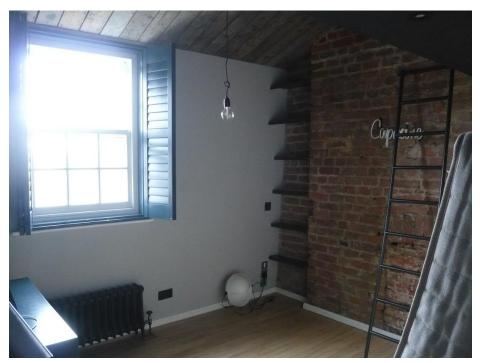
Replacement window and modern plantation shutters within the rear bedroom on the third floor
